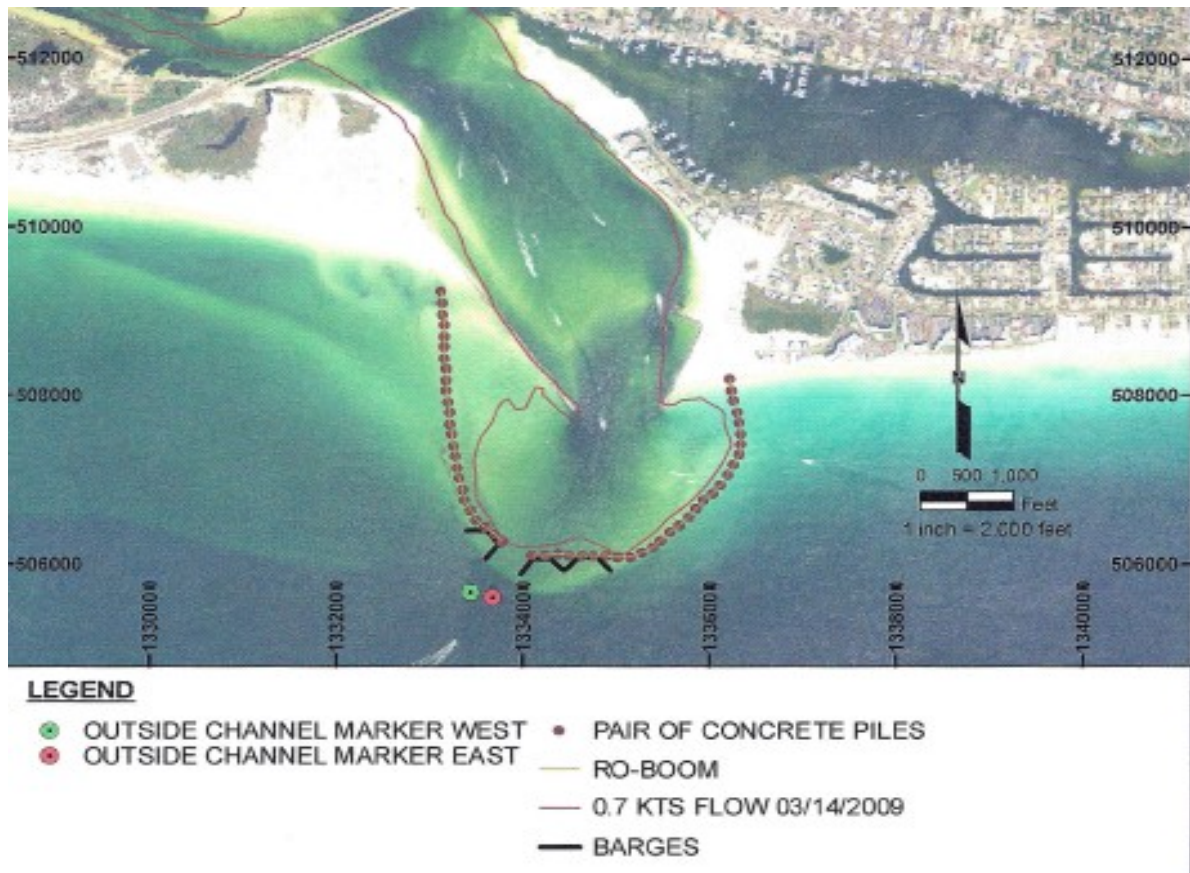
Barge and pile supported Ro boom plan outside of East Pass.
